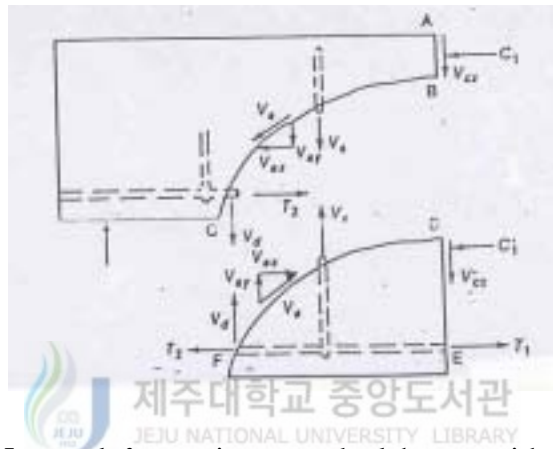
Internal forces in a cracked beam with stirrups
